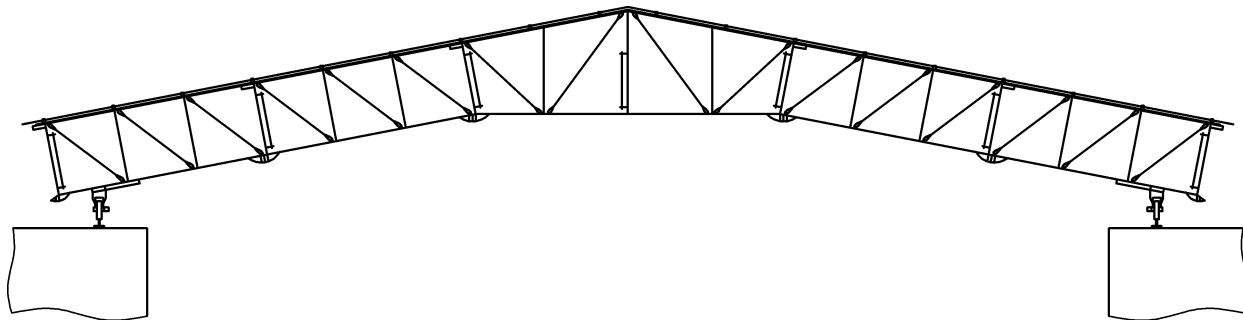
Example of a temporary roof which is supported by an existing permanent construction
